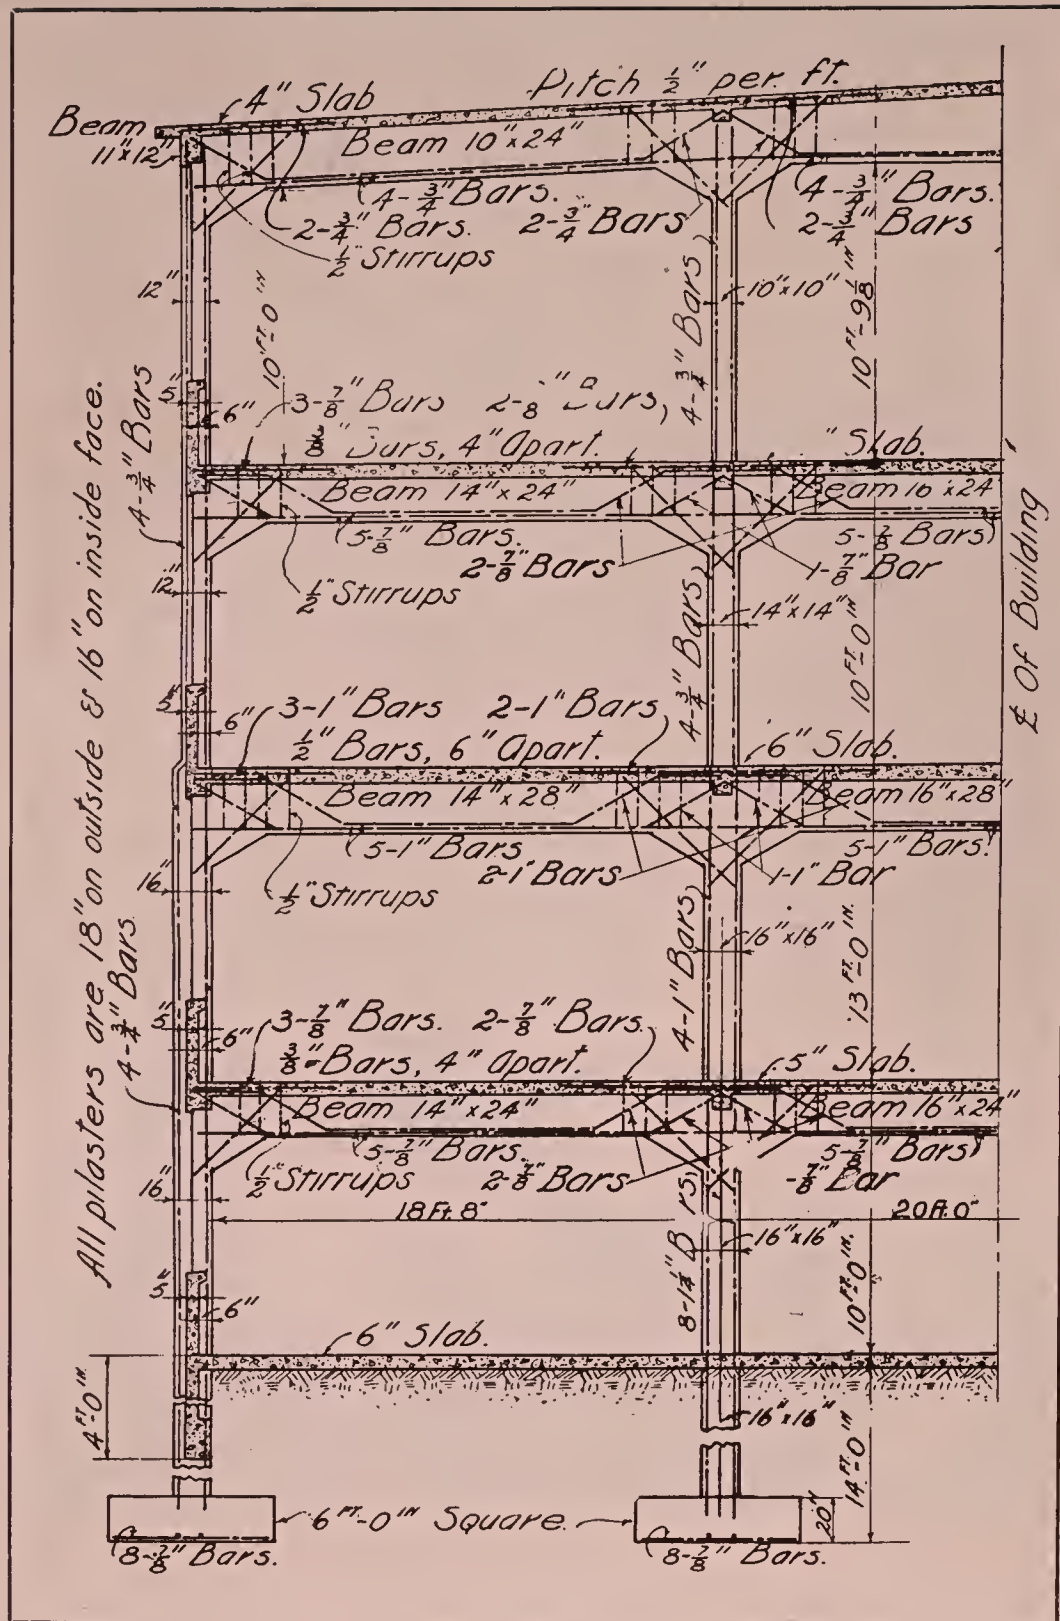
Cross Section of Warehouse, Boston Woven Hose and Rubber Company.
